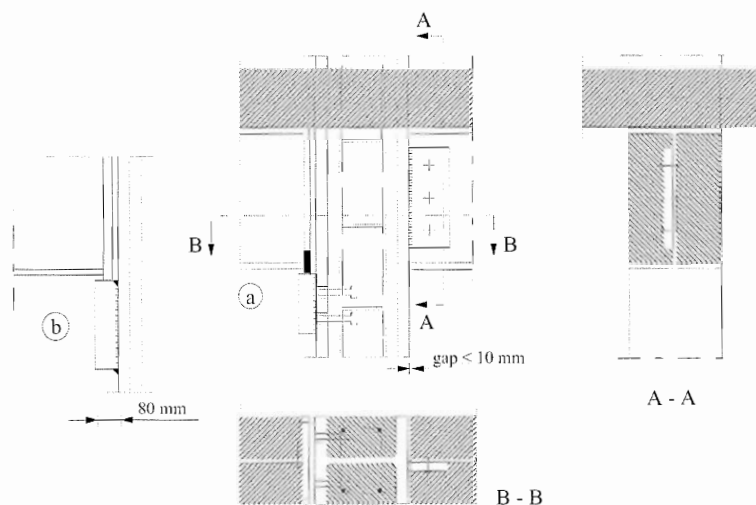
Examples of connections to a totally encased steel section of a column.
